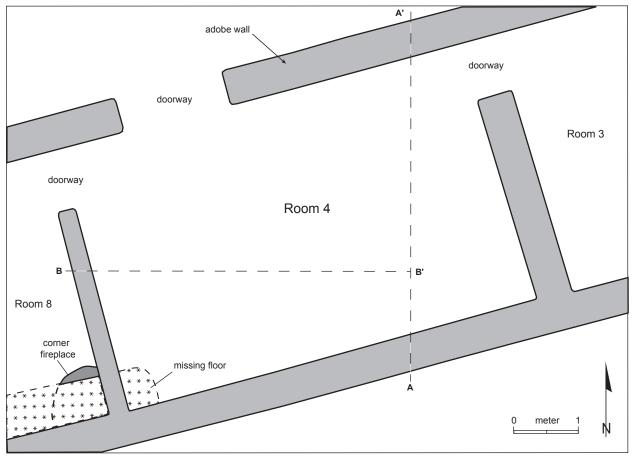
Plan of Room 4, Structure 1 at the Trujillo House.
